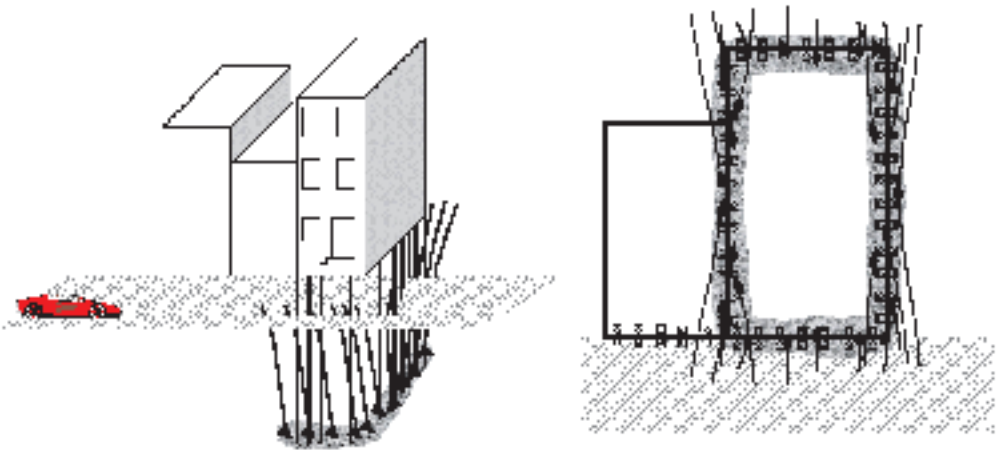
Schematic Presentation of Permeation Grouting Wooden Pile Foundation (Whole Structure)
